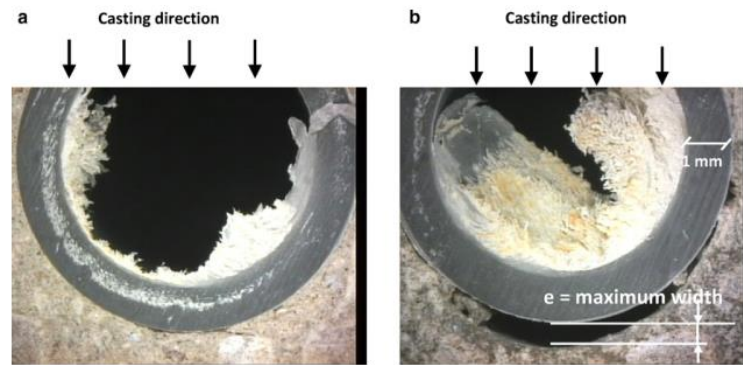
Observation of steel concrete interface (a- steel bar at the bottom, b-steel bar at the top) [1]
